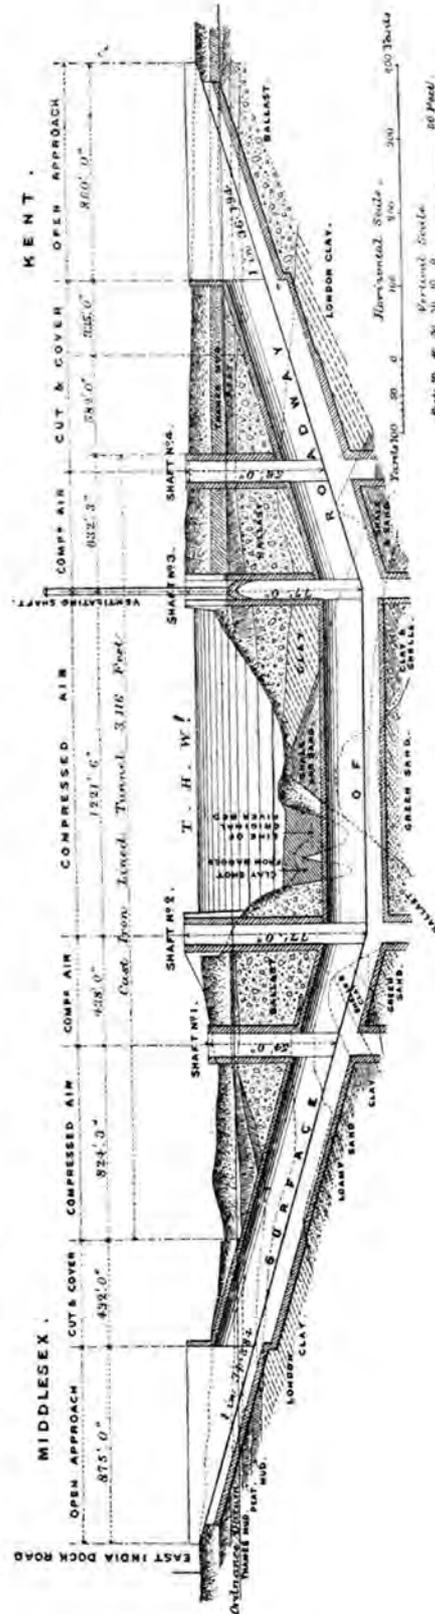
THE BLACKWALL TUNNEL, LONDON.
